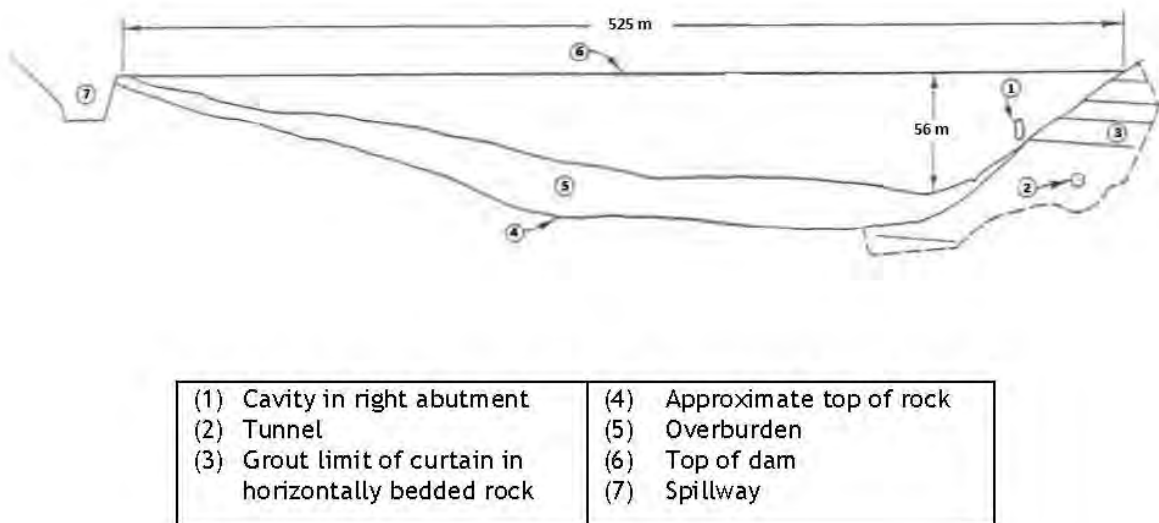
Profile of East Branch Dam. Note location of cavity in the right abutment.
